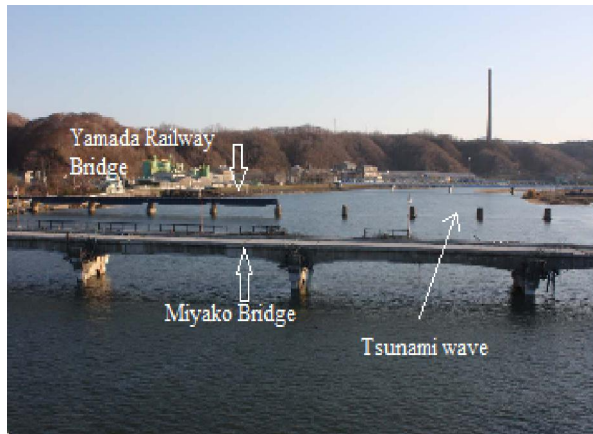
Damaged Miyako bridge and Yamada railway bridge during Japan Tsunami
